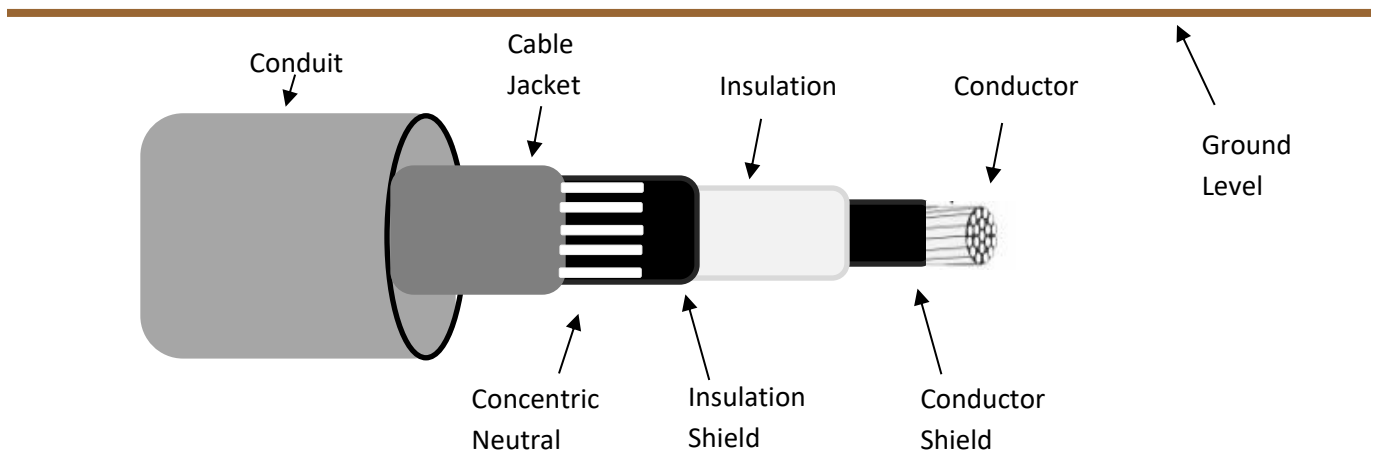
G VEC Standard Installation of Underground Conduit and Conductor
